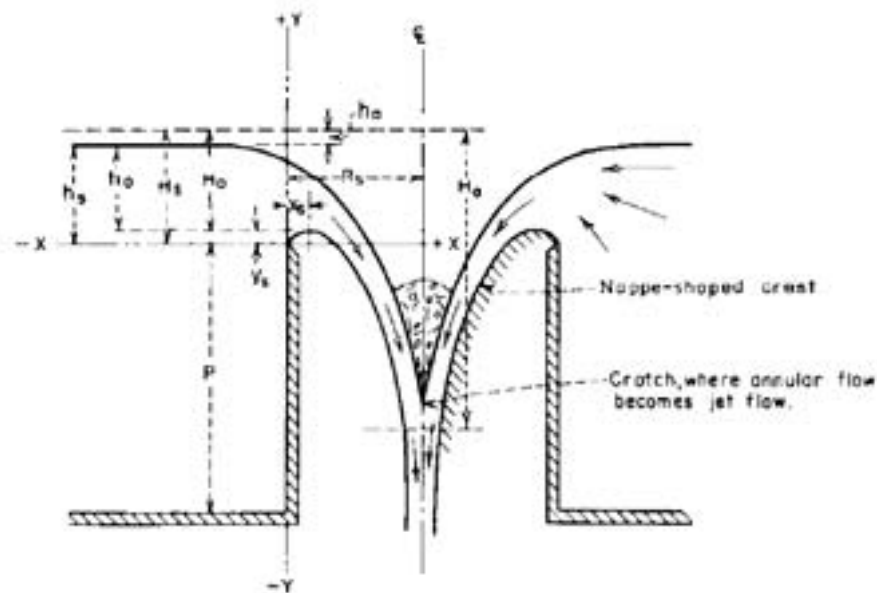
Elements of nappe-shaped profile for a circular weir (Design of Small Dams Figure 9-56 (1987))
